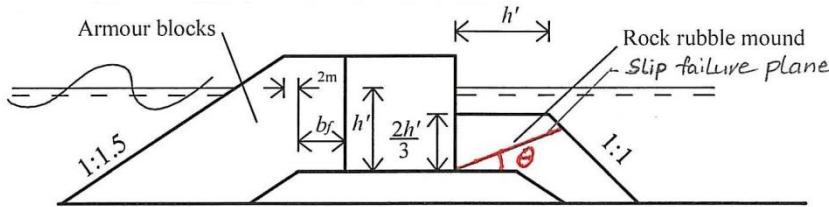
Armour blocks in front of caisson and rubble mound behind caisson as means of repair.
